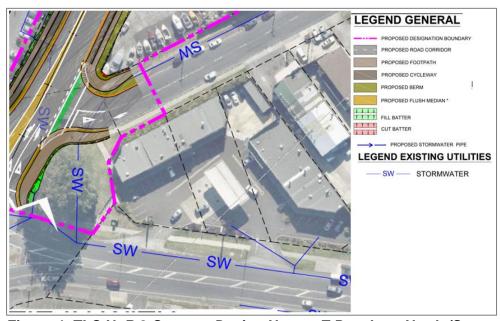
TLC NoR 2 Concept Design Next to Z Papakura North (Source: TLC NoR 2 General Arrangement Plan)
